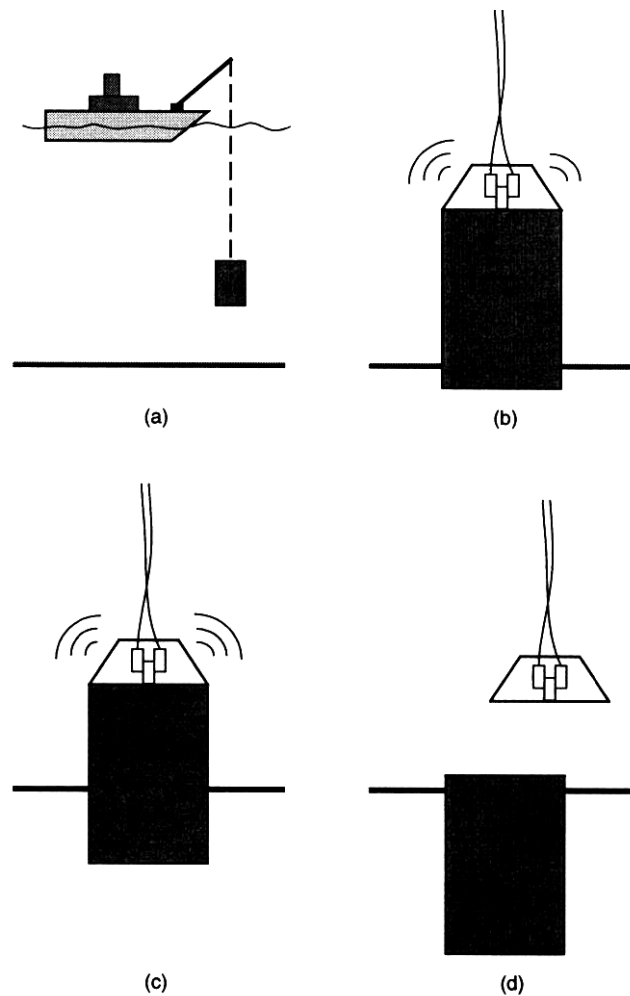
Suction caisson installation(Pavlicek,1992)
